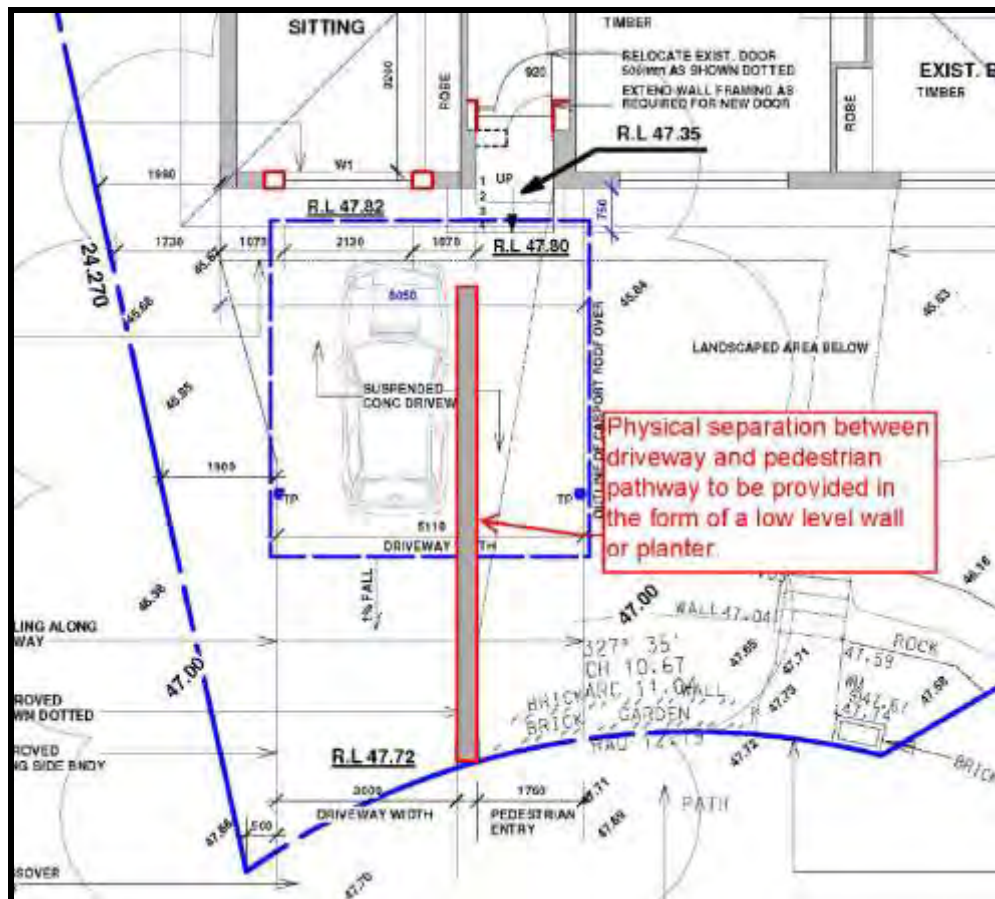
Physical separation between driveway and pedestrian pathway in the form of a low level wall or planter to be provided by a condition of consent.
